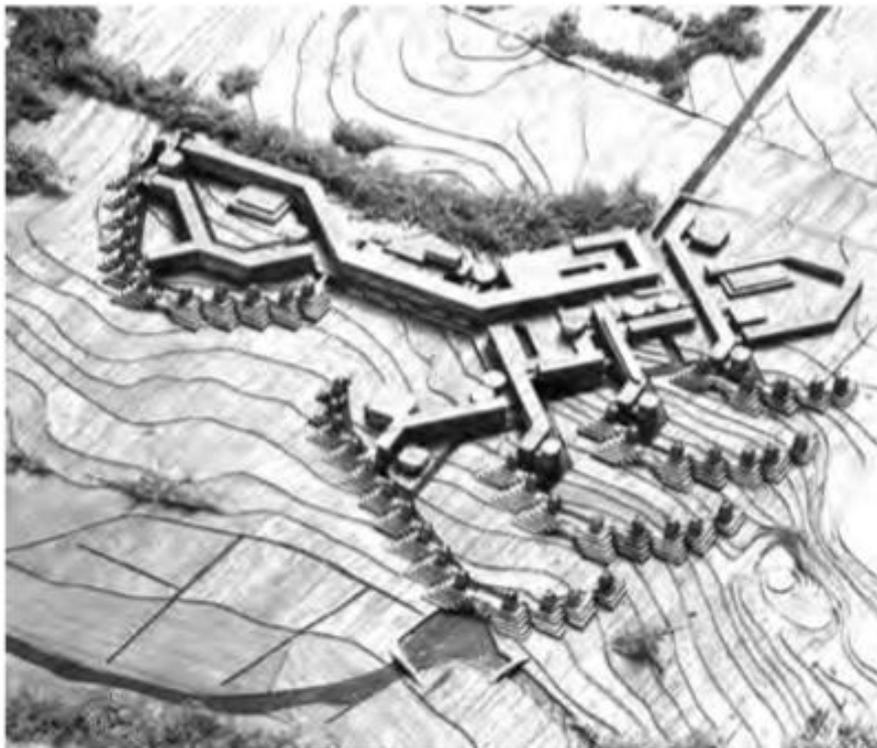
Detail from Lasdun's first draft development plan (Broom-Lynne and Coupland, *University of East Anglia Landscape Strategy*)
